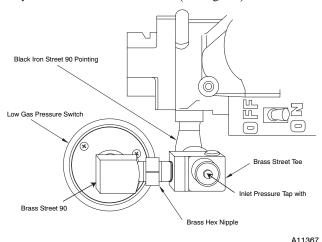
LGPS for 14-3/16-in. (360 mm) Casing or When Vent Passes Between Inducer and Burner Assembly
